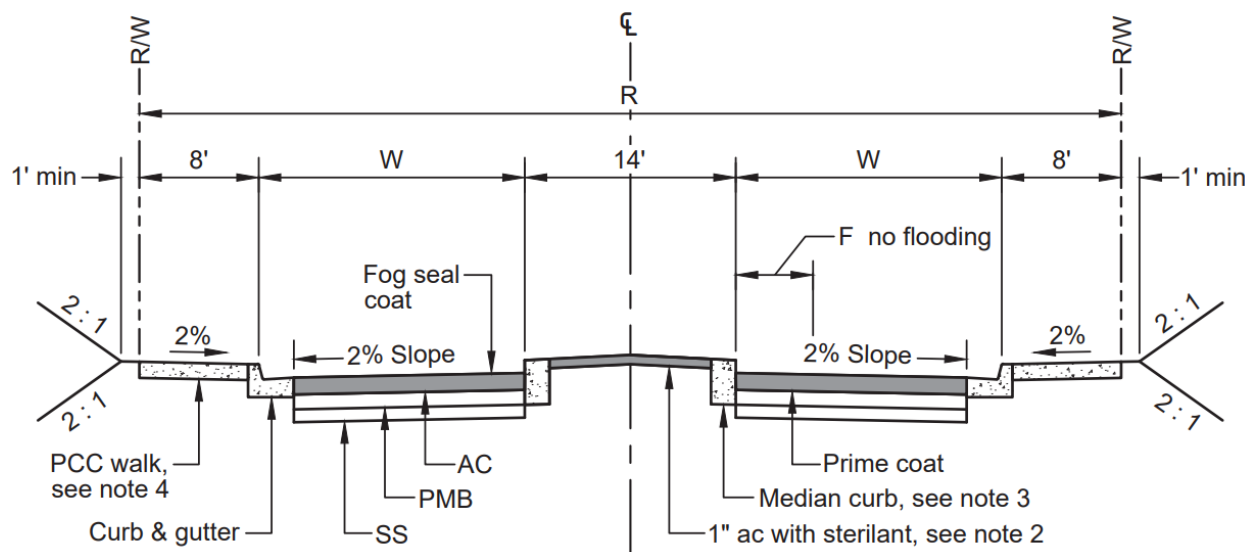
Plate B-2 cross section. R – Right of way width; W - Pavement width; F- Flooding free width.
